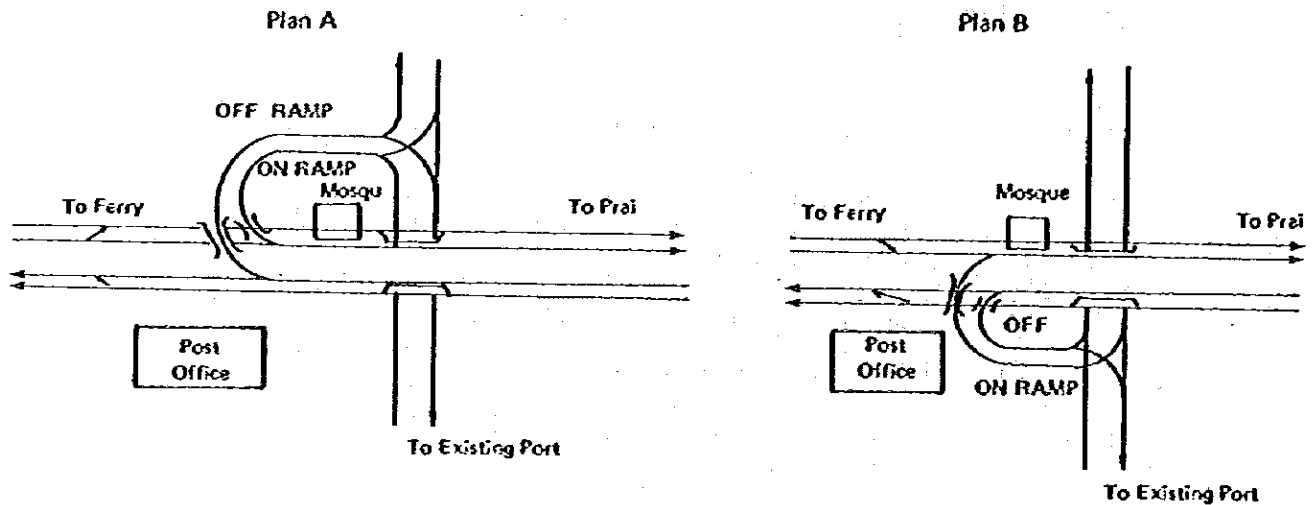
ALTERNATIVE INTERSECTION PLANS
